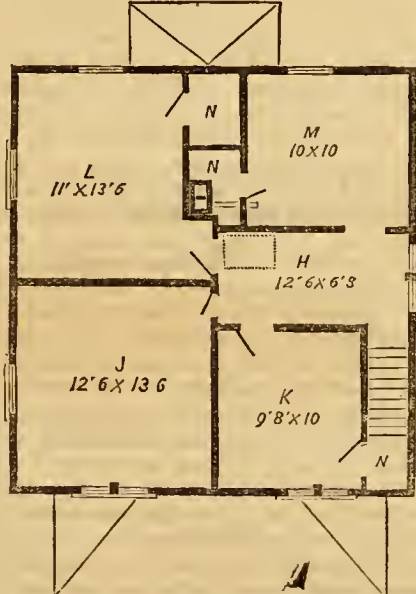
SECOND FLOOR, OR CHAMBER PLAN. H., Hall; J., K., L., M., Bedrooms of the sizes indicated; N., N., Closets.
